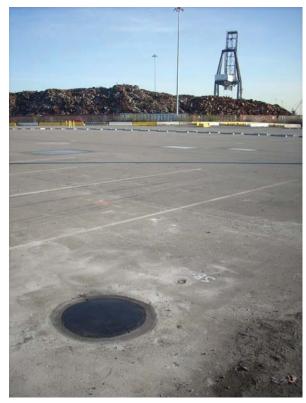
Repaving of Former UP Roundhouse site, facing north.
